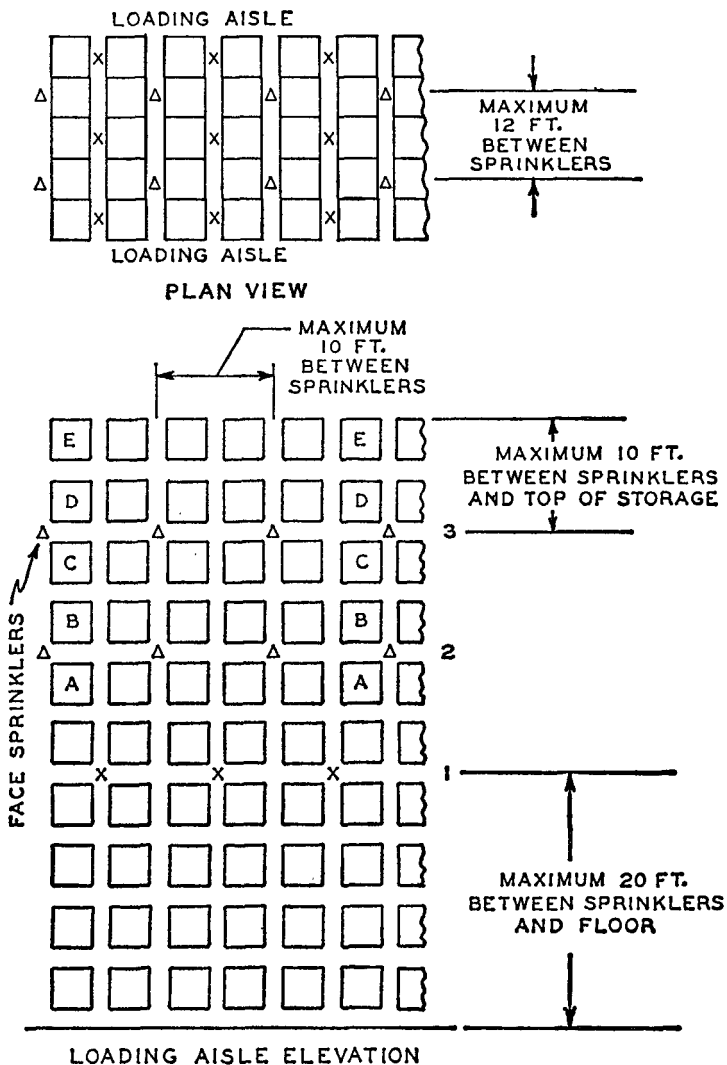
In-Rack Sprinkler Arrangement — Multiple Row Racks, Class I Commodity. Height of Storage over 25 Feet.
